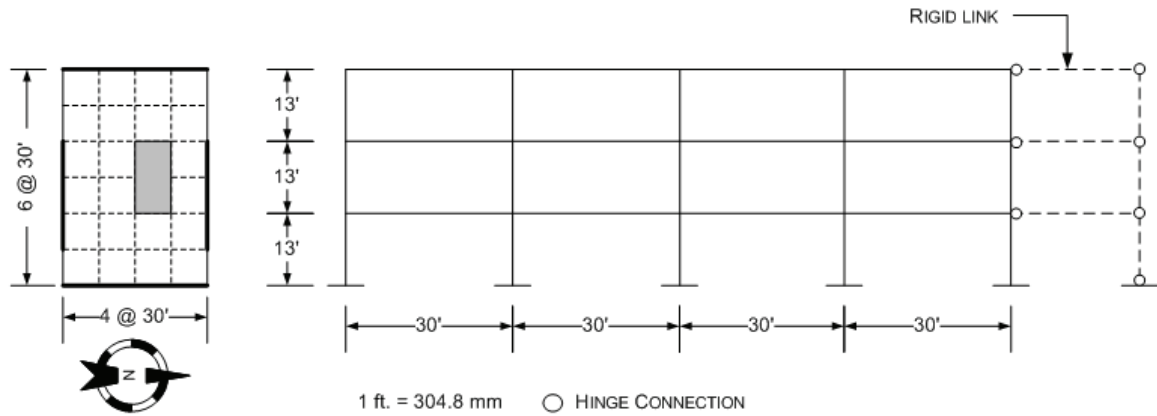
Floor plan (FEMA 355-C) and analytical model for Frame 3ST-FR.
